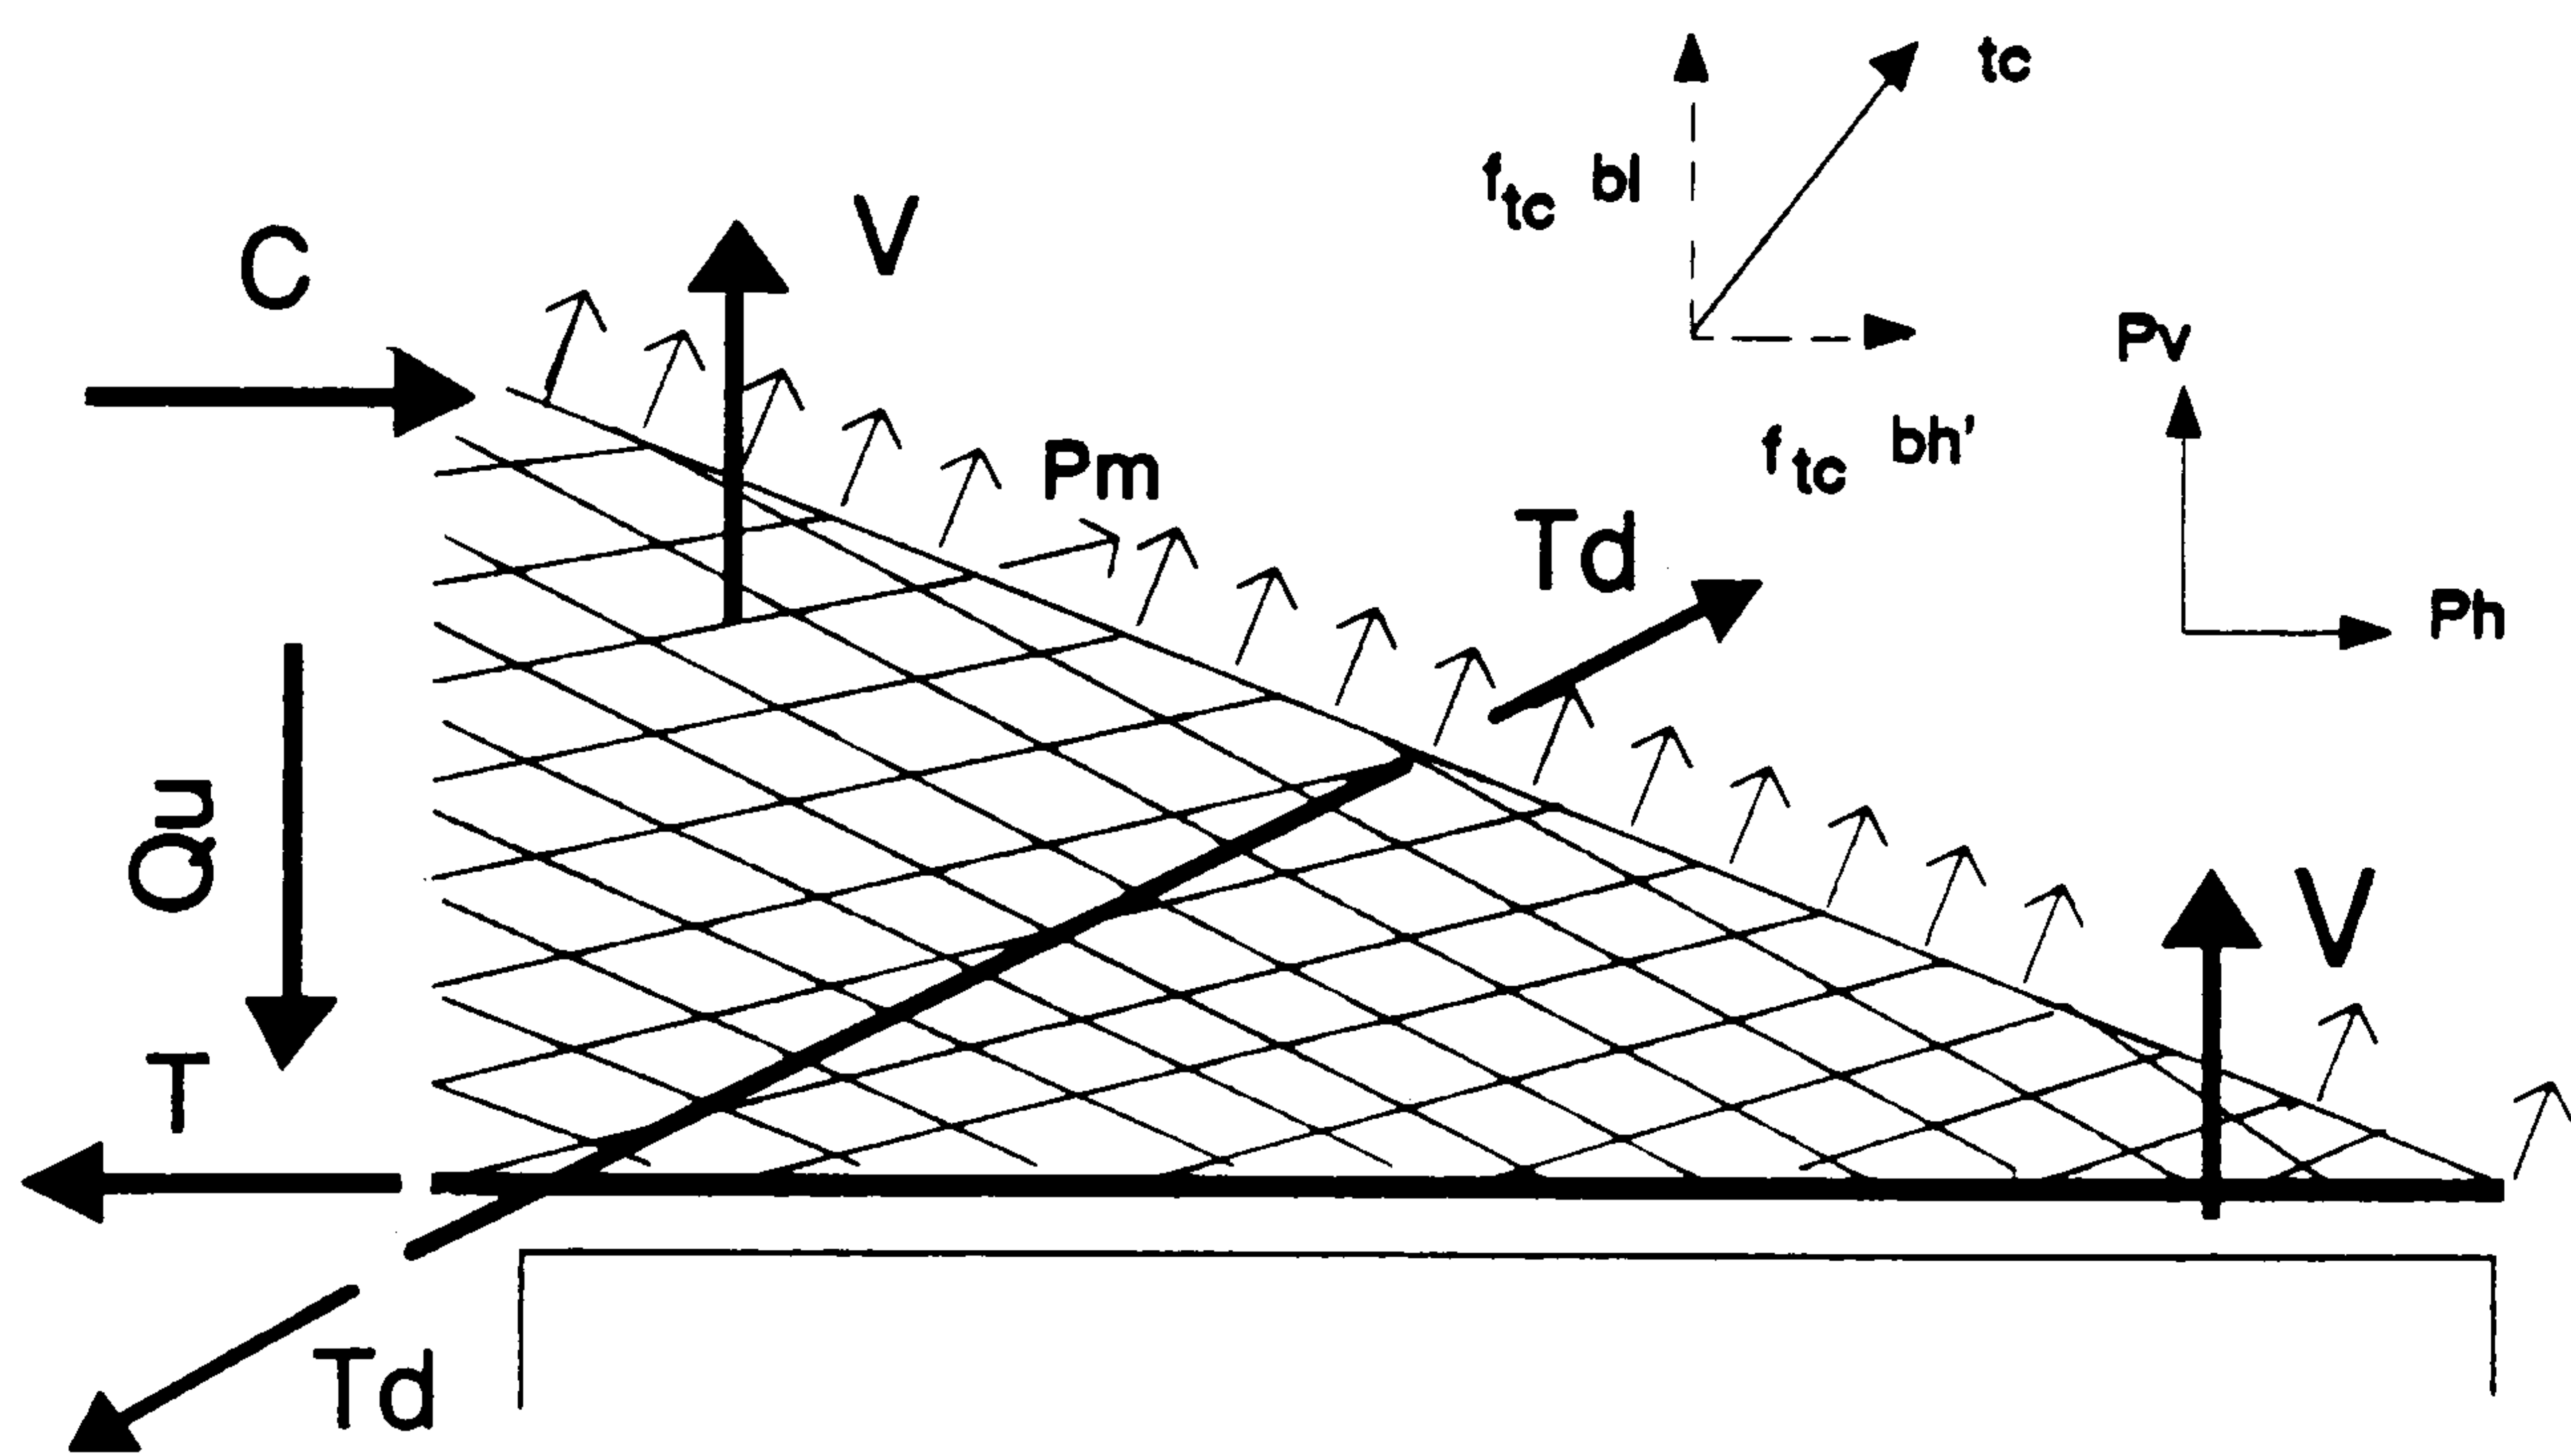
Beam with mesh reinforcement and diagonal reinforcement bars
